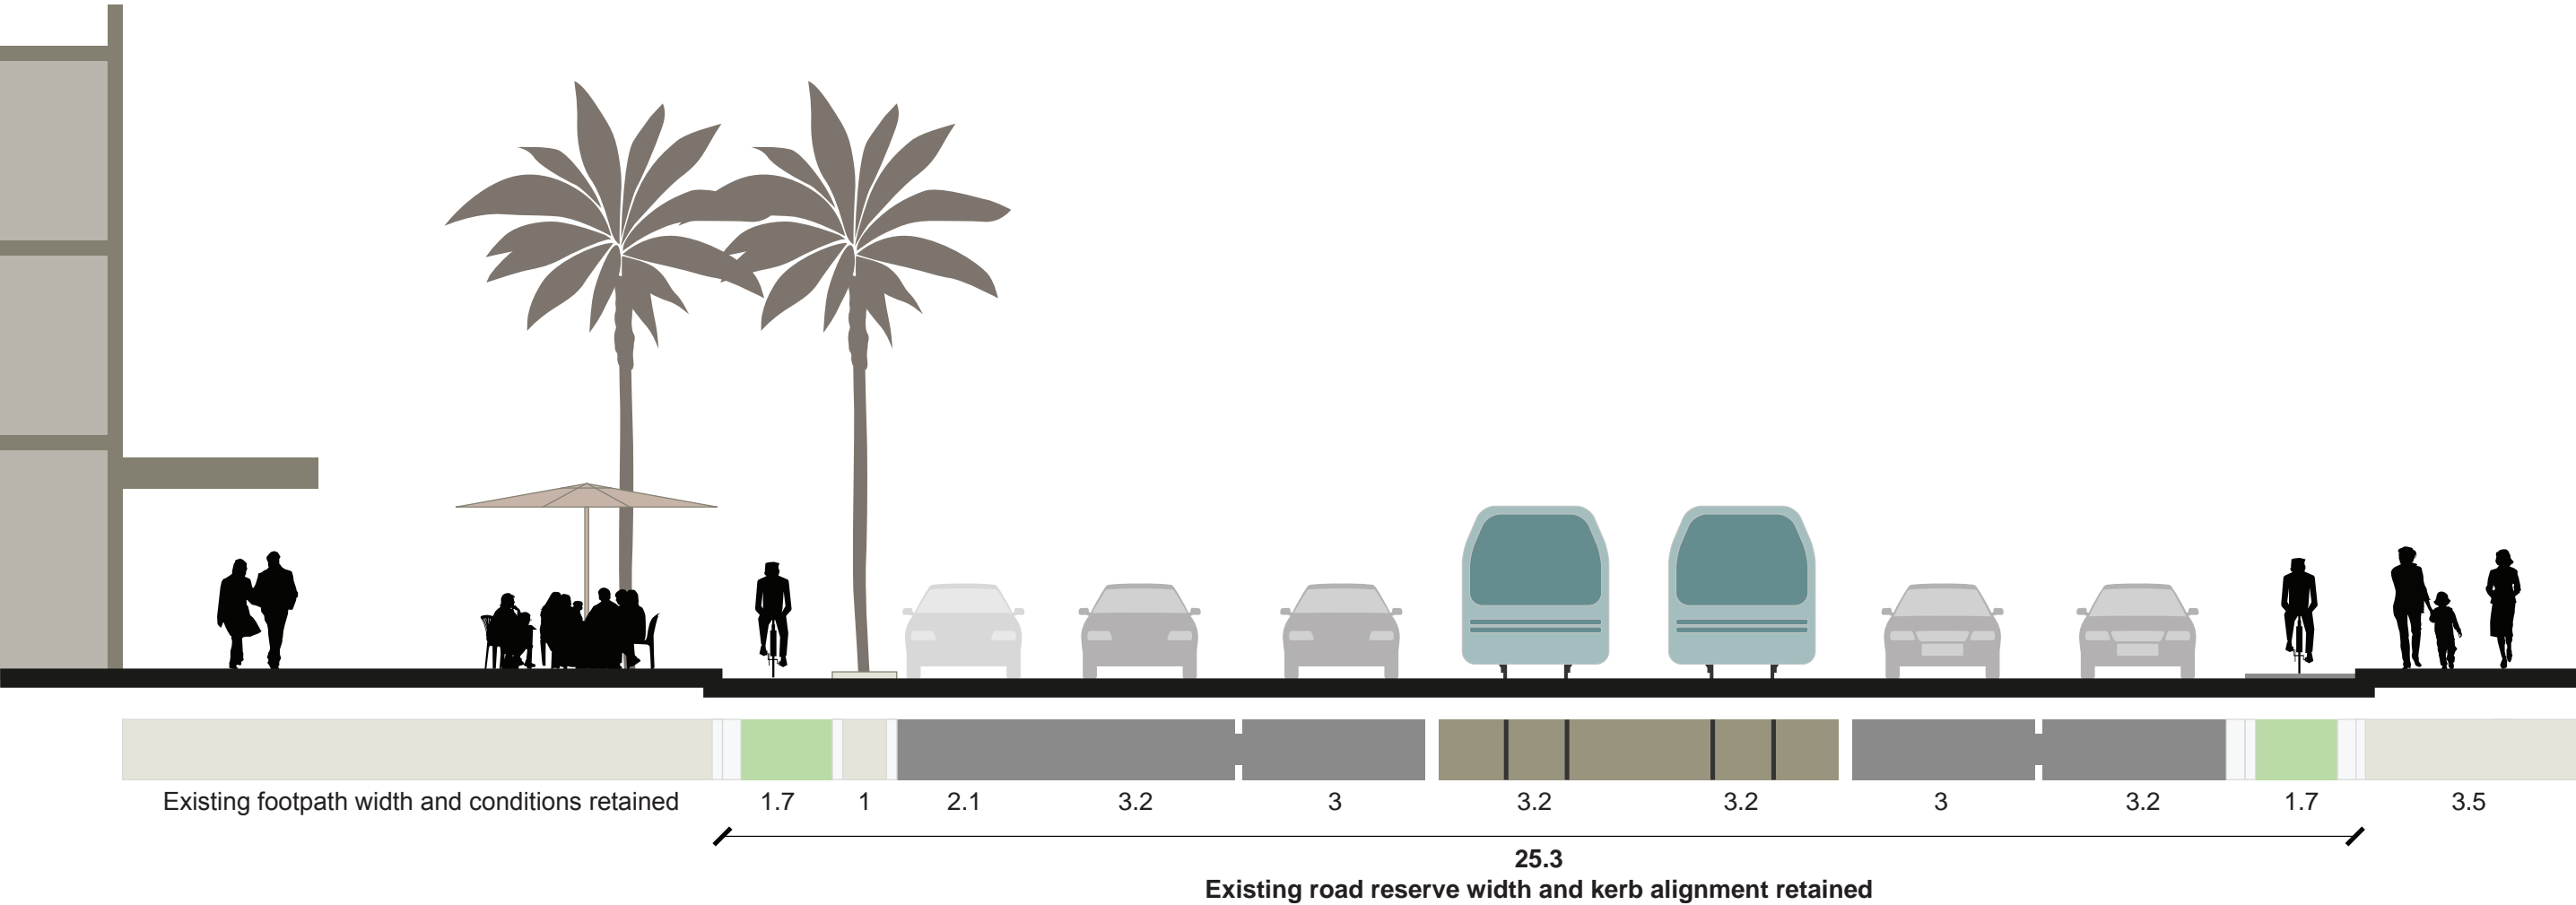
Campbell Parade Typical Carriageway: Indicative Cross Section B
